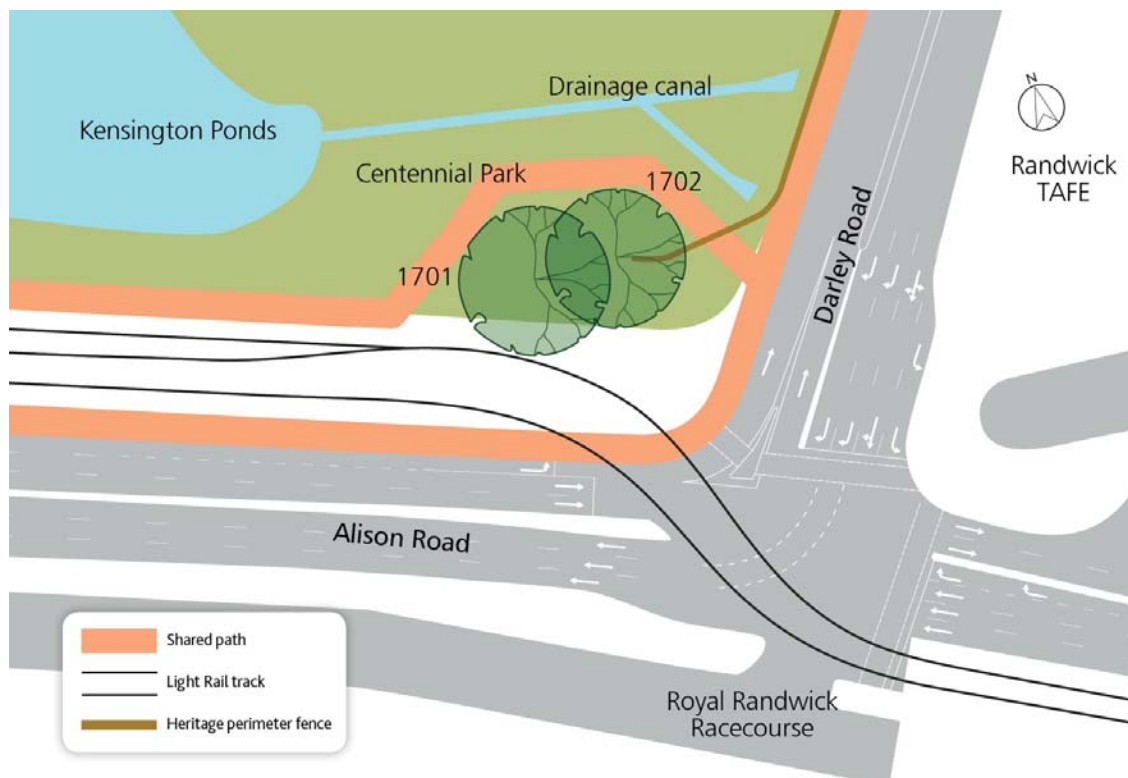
Proposed layout of Option four where the shared path is diverted around into Centennial Park (not to scale).
